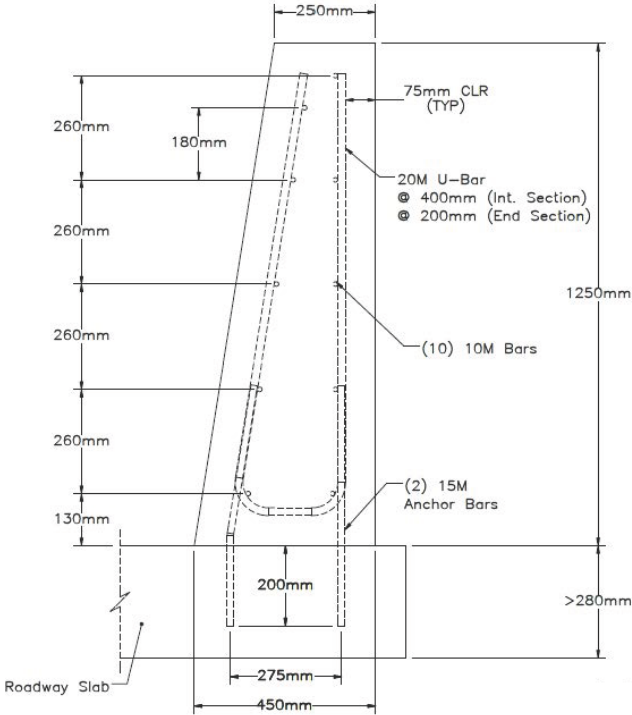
TL-5 Manitoba Tall Wall Reinforcement Layout and Dimensions [11]
